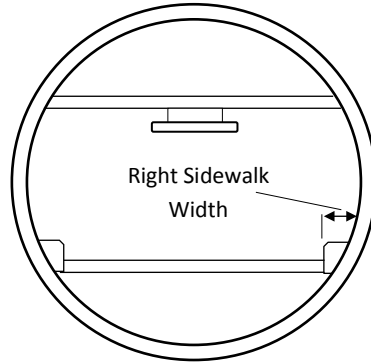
Sidewalk Width Looking in the Direction of Inventory
